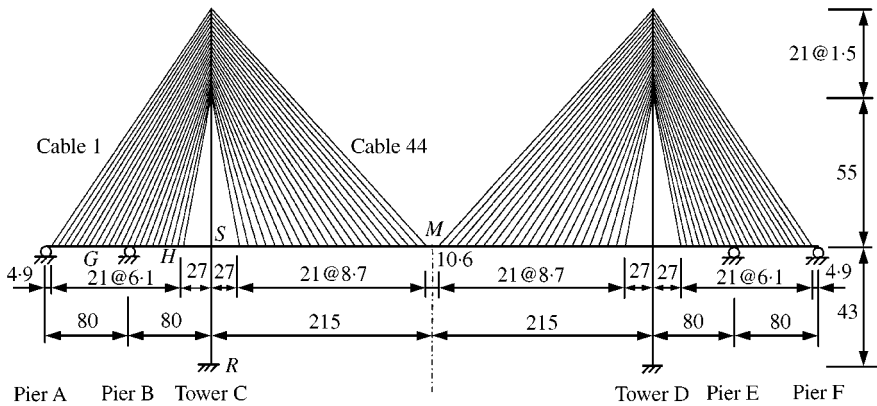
Simplified model of a cable-stayed bridge (dimensions in m).
